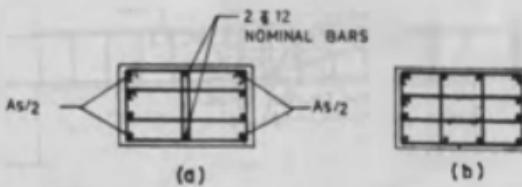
Steel arrangement in a column section. (a) $A_s/2$ on opposite faces; (b) $A_s/4$ on each face (12-bars arrangement shown as an example, 8 to 24 bars can be provided).
